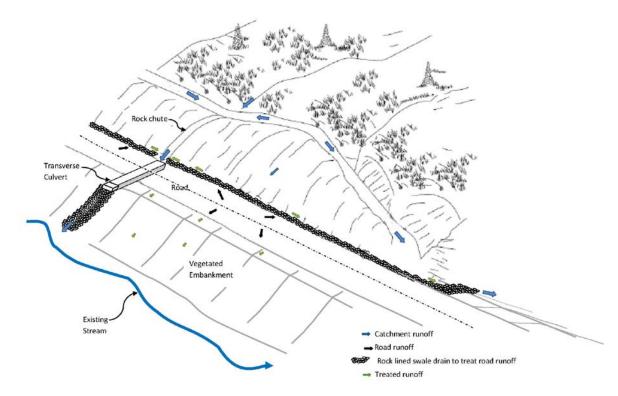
Schematic of stormwater drainage elements within the road corridor
